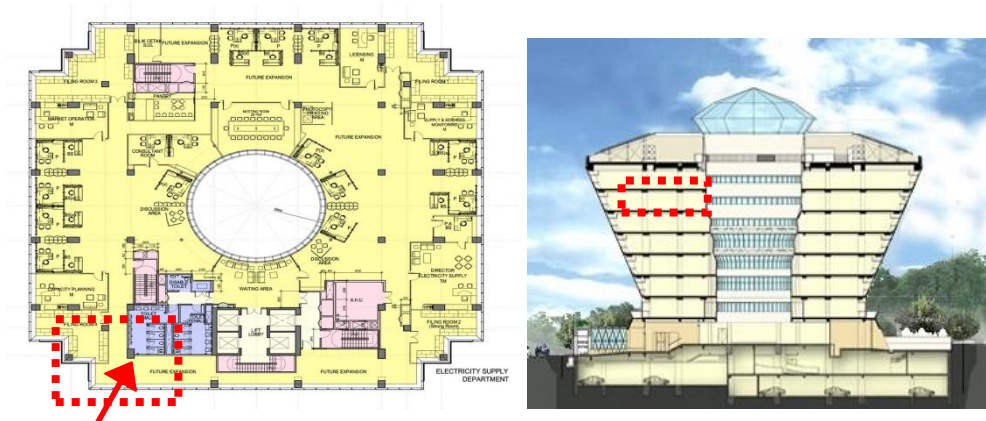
ST Diamond building (a) plan of the level four, (b) section
